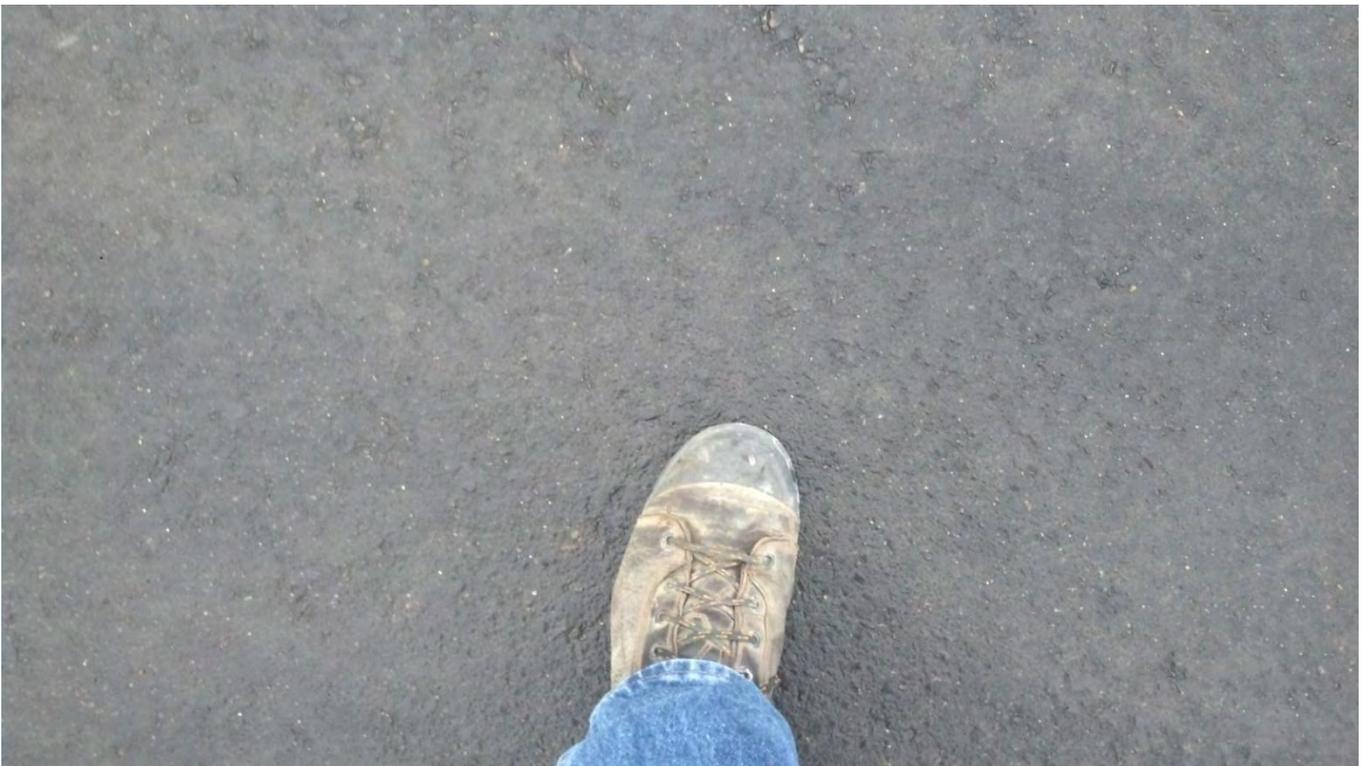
Hawley Park Road: Placement of Dry Froth 3/4" Mix
